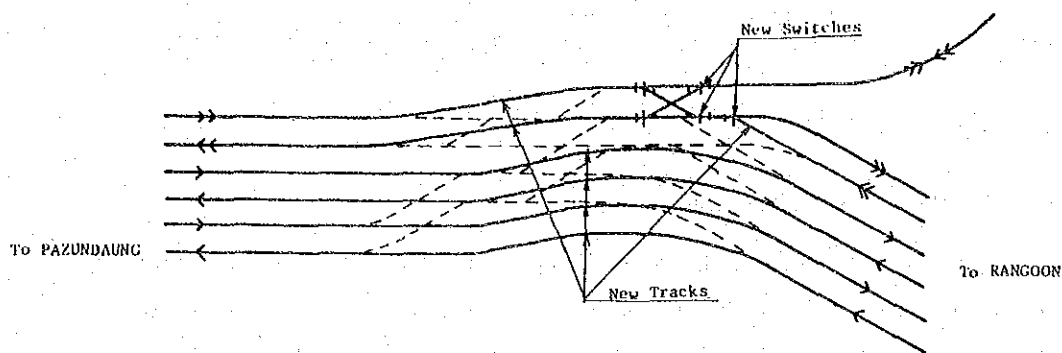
Track Layout Modification (RANGOON-PAZUNDAUNG)
